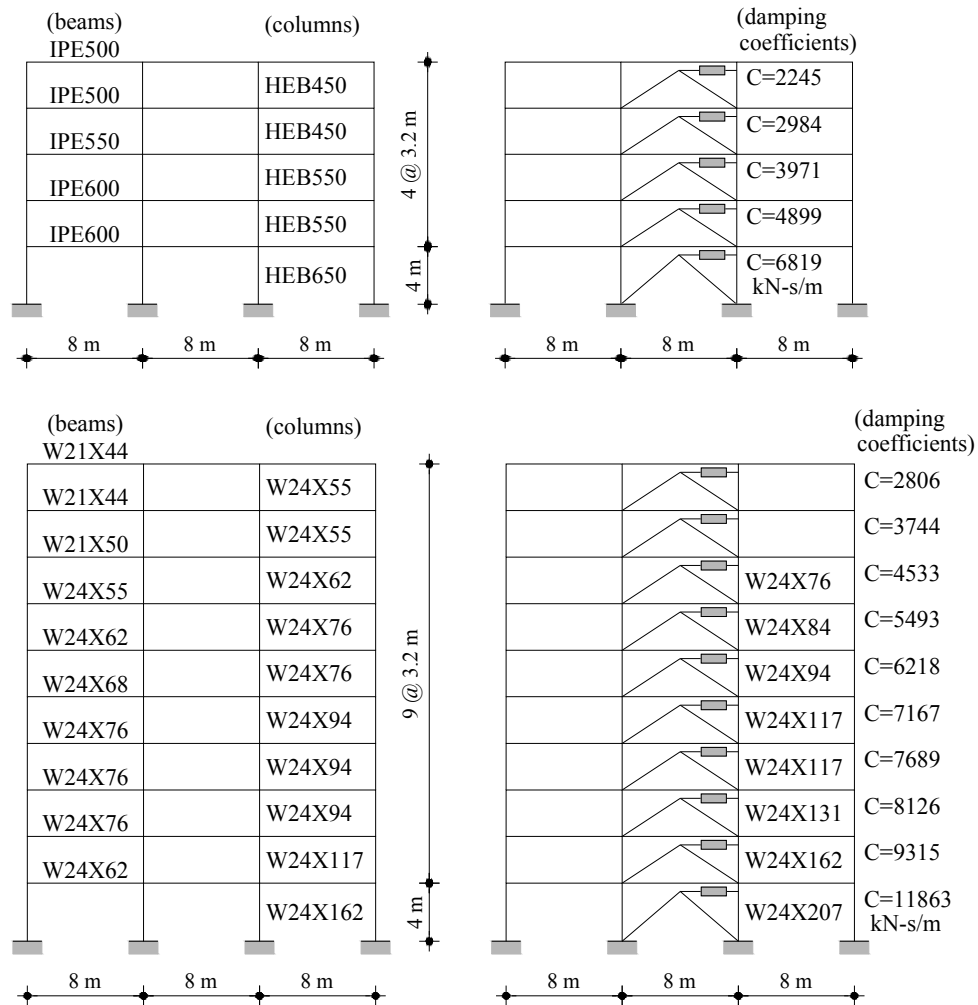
Elevation view and beam/column cross-sections of the 5-storey and the 10-storey steel MRFs with and without viscous dampers. The damping coefficients of the viscous dampers are also provided. The beam/column cross-sections of the MRFs with viscous dampers are the same with those of the corresponding MRFs without dampers apart from the indicated interior columns
